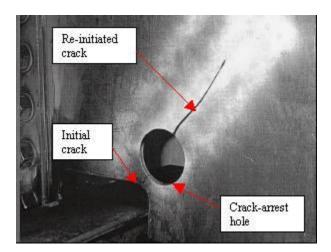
Fatigue crack reinitiating through crack-arrest hole (Dexter 2004)
